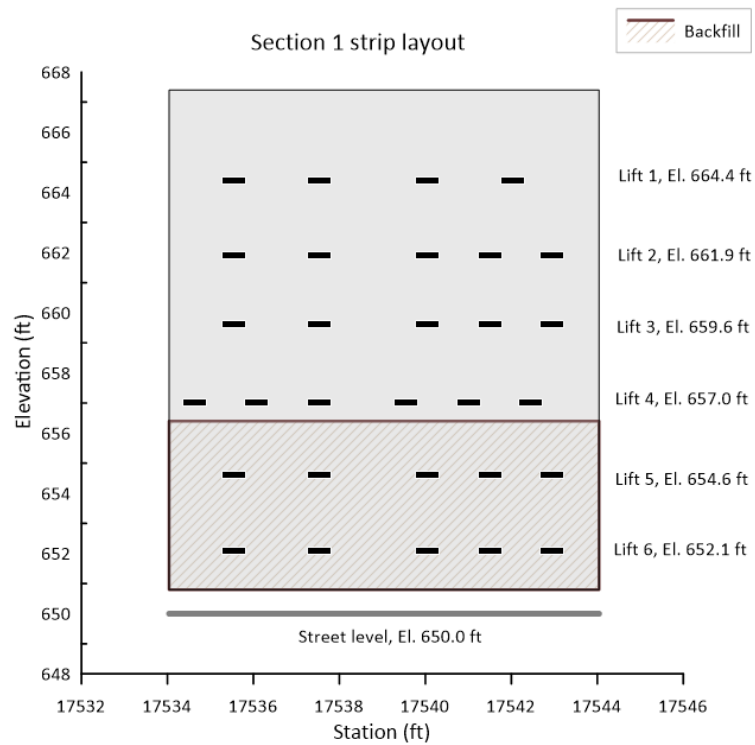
Elevation view showing the reinforcing strips' layout in Section 1 (strip dimensions are not to scale).
